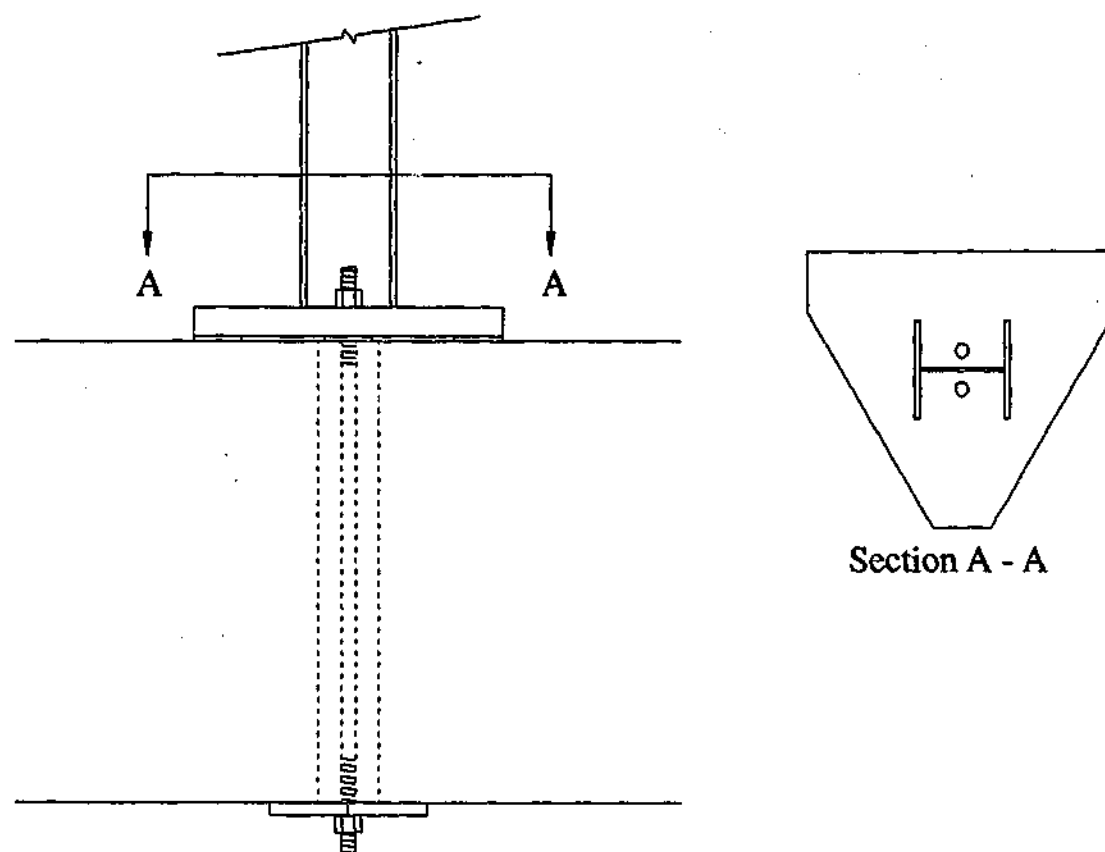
Column secured to strong floor with pre-tensioned anchor bolts
